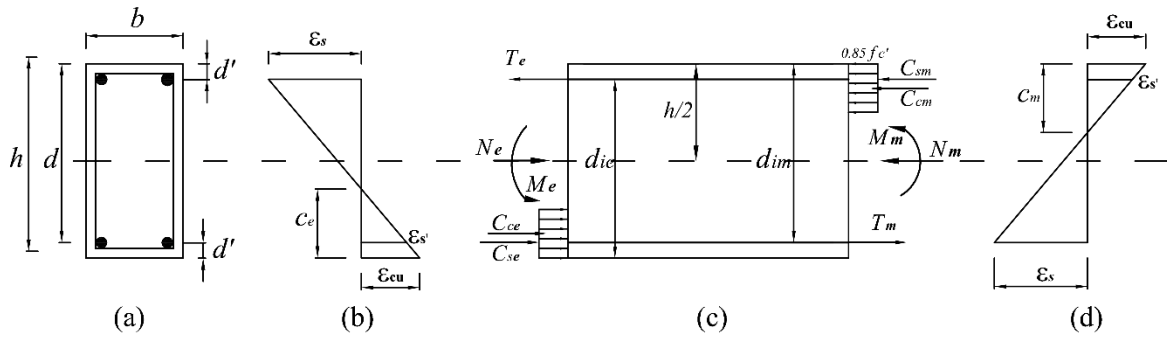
Strain and force distribution (a) beam section, (b) strains at beam end section, (c) moments and forces at beam section and (d) strains at middle joint section.
